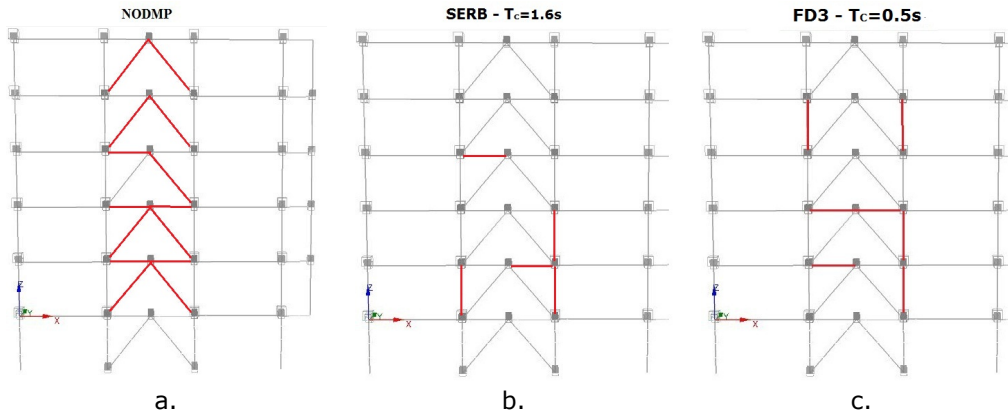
Plastic hinge location at CP a) No damper; b) SERB damper; c) FD3 damper (soft soil)
